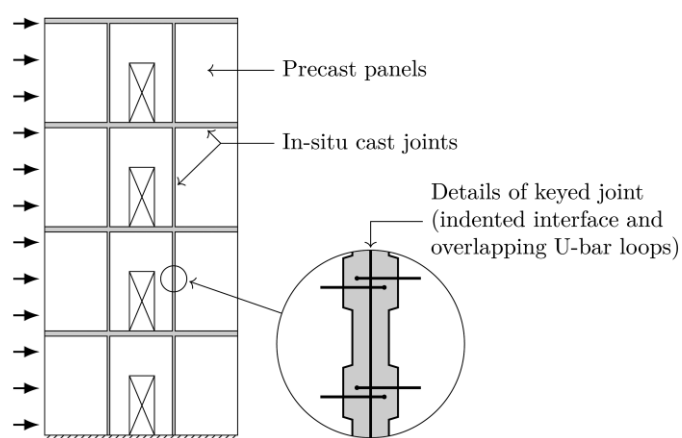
Four-storey shear wall constructed from precast units connected by in situ joints
